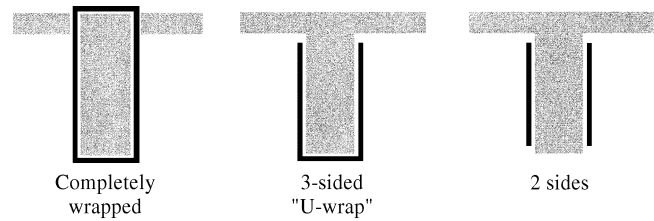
Typical wrapping schemes for shear strengthening using FRP laminates.
